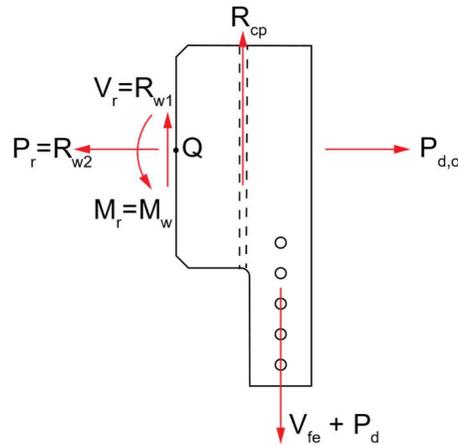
Special external continuity plate with a cut at the cover plate section.
